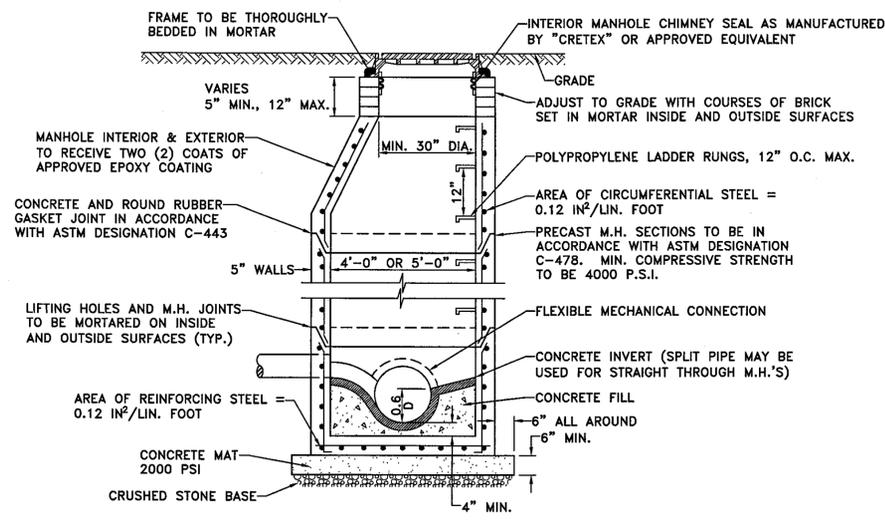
TYPICAL SANITARY SEWER MANHOLE FRAME AND COVER
